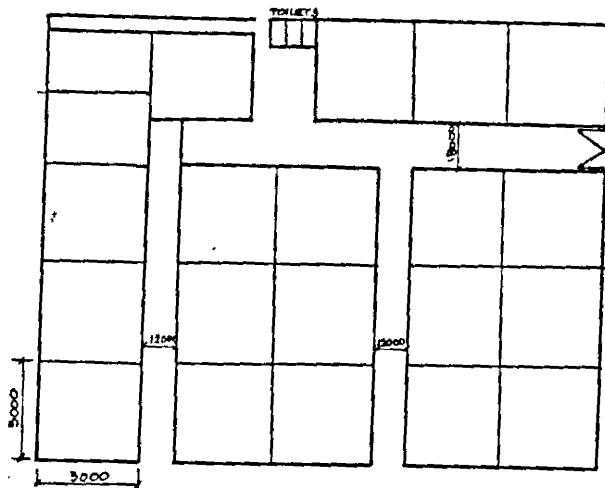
TYPICAL PLOT LAYOUT - RACE COURSE
